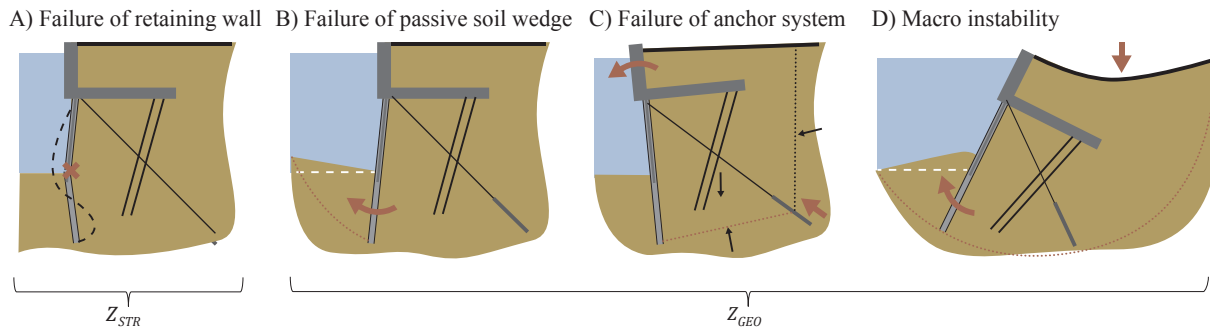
Impression of some of the structural (Z_{STR}) and geotechnical failure modes (Z_{GEO}).
